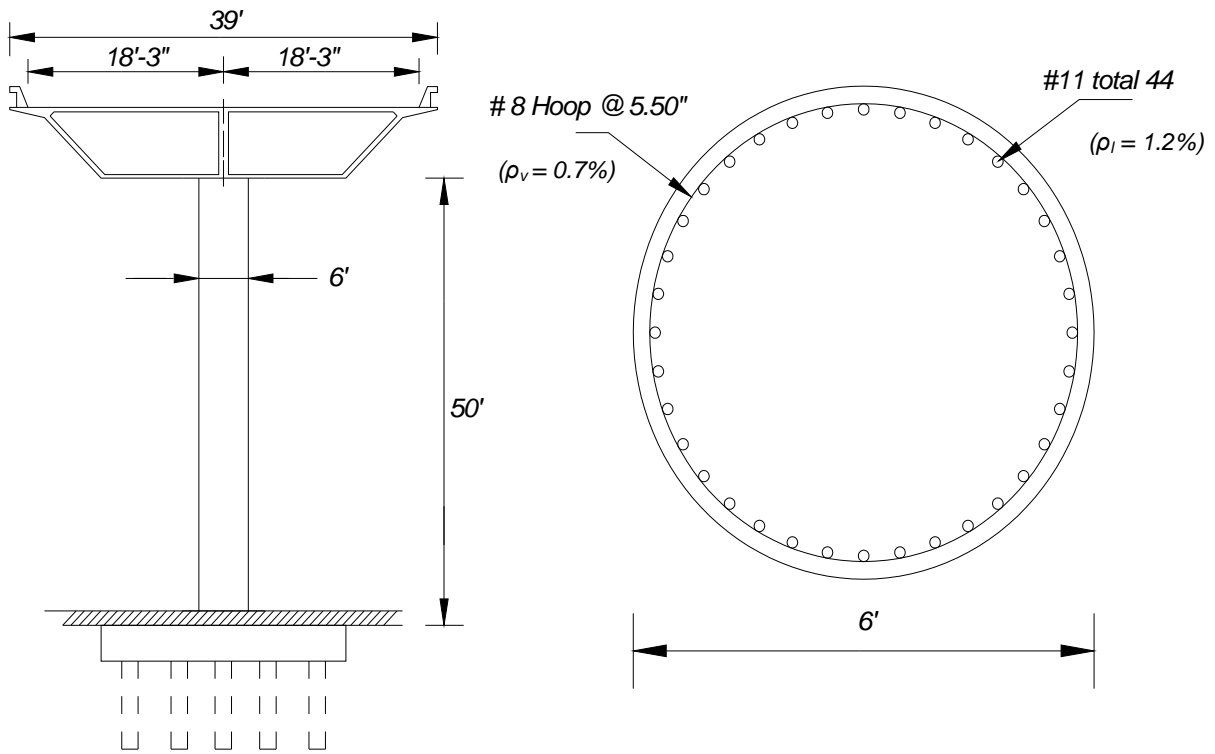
Geometry and reinforcement details of the prototype bridge column (Ketchum et al. 2004).
